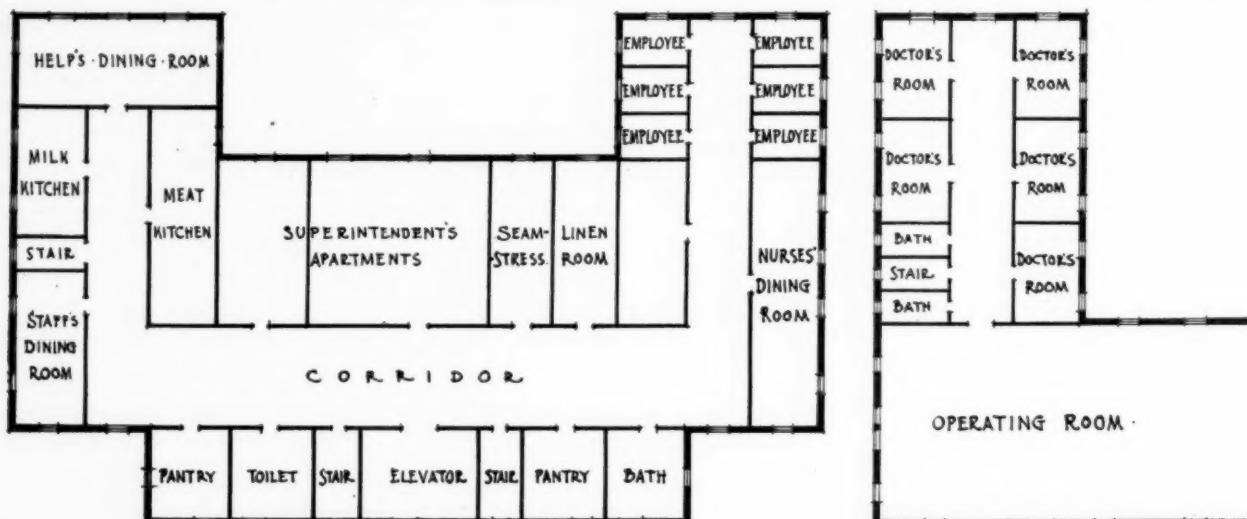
Beth Israel Hospital. Fourth floor plan before changes.
